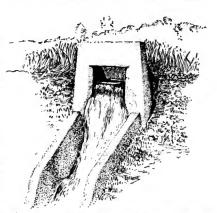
Concrete hydrant and measuring weir used by Gage Canal Company.
